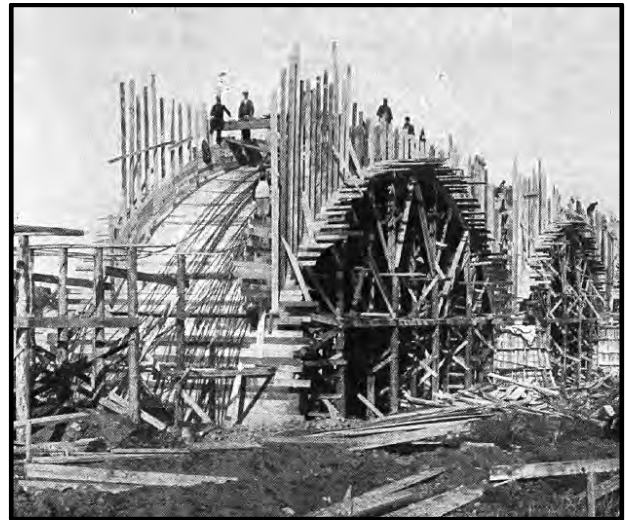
Erecting centering, Maumee Bridge, Waterville, Ohio, before 1909 (National Bridge Company 1908:137).
